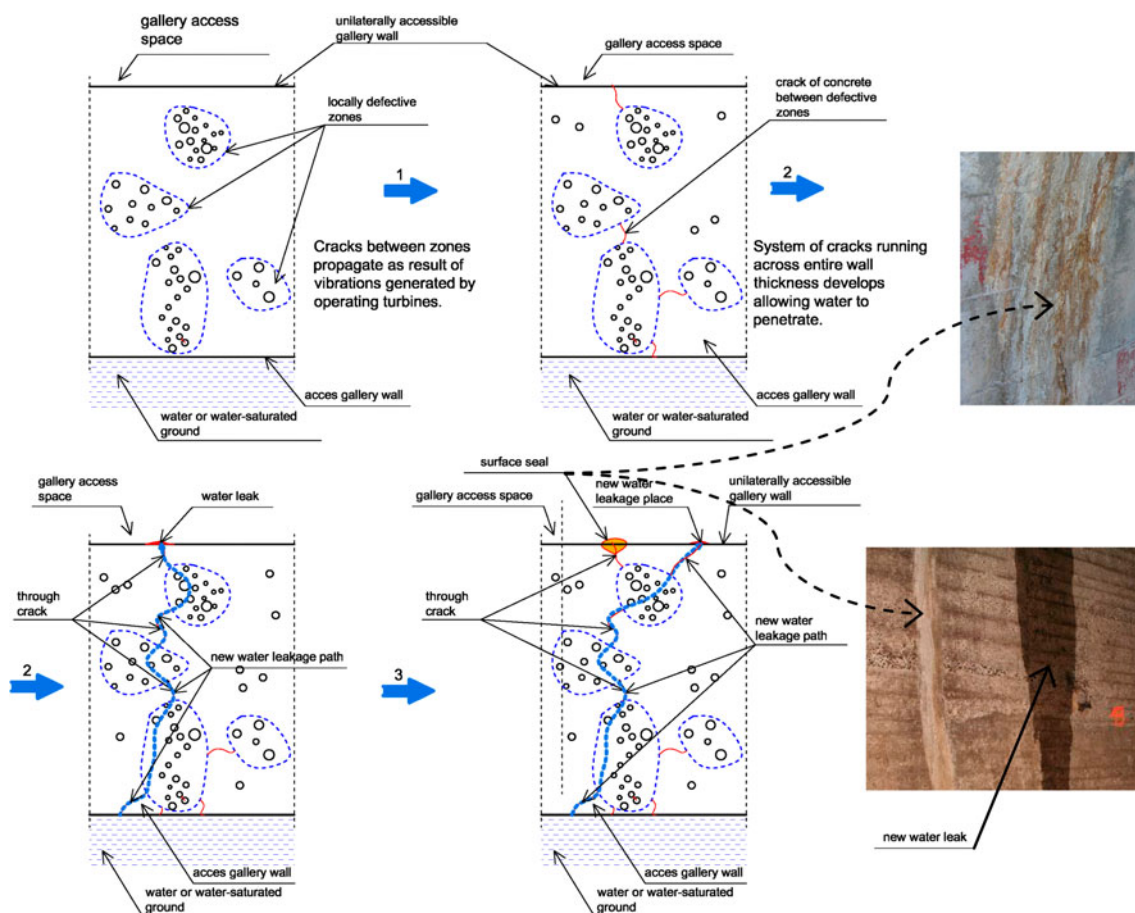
Hydroelectric power plant access gallery and illustration of how water leaks through its walls arise
